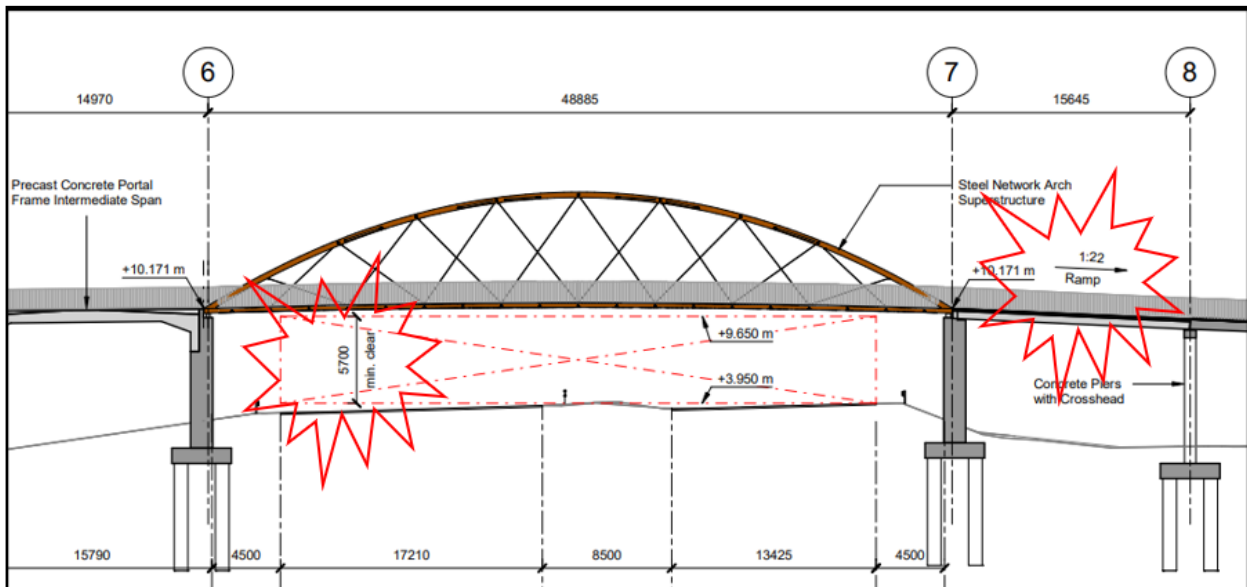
Cross section of Bridge over the road showing vertical clearance and maximum slope.
